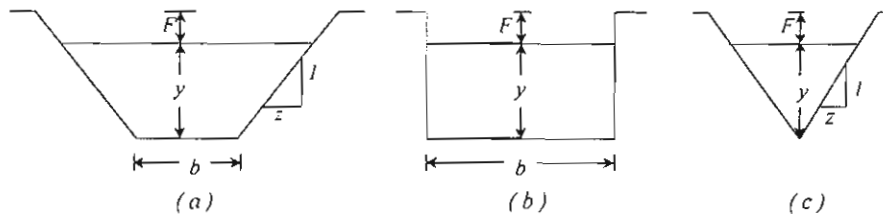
Canal Sections: (a) Trapezoidal Section; (b) Rectangular Section; and (c) Triangular Section
